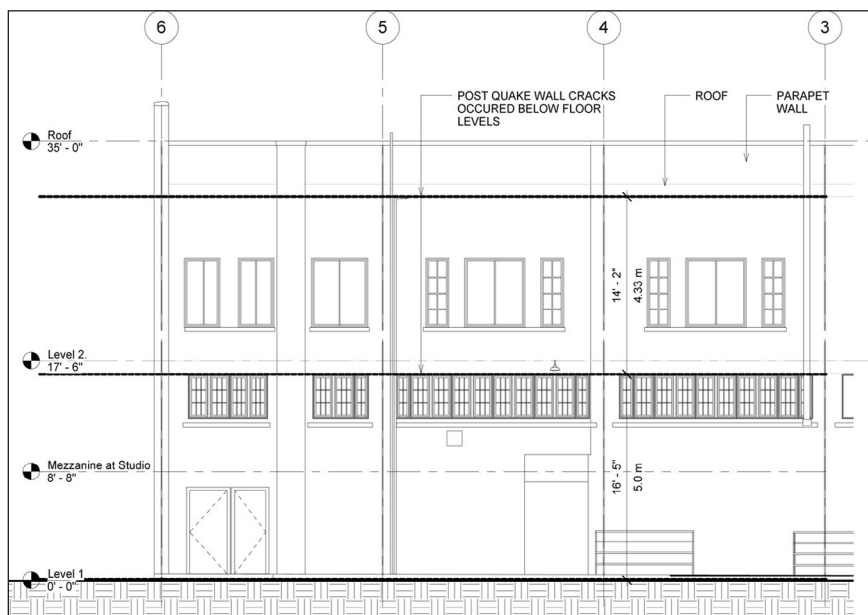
North wall 2D drawing with dimensions showing below floor/roof cracking.
